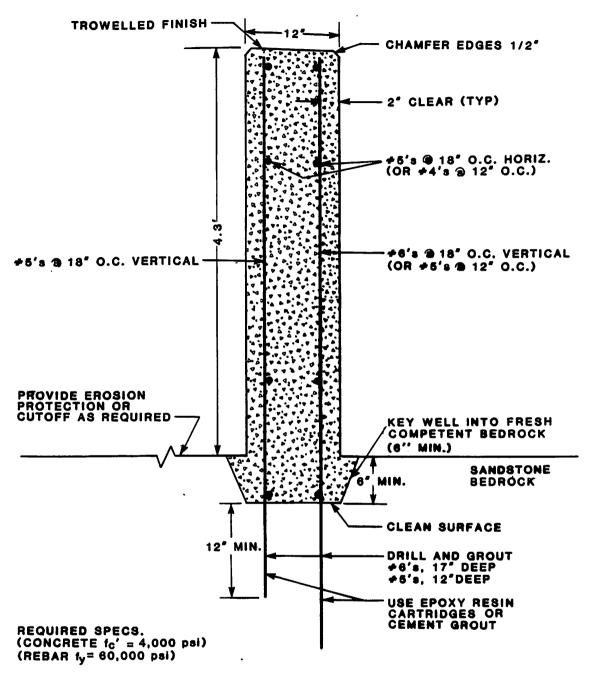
Typical Section Concrete Wall Dam TPC-A
